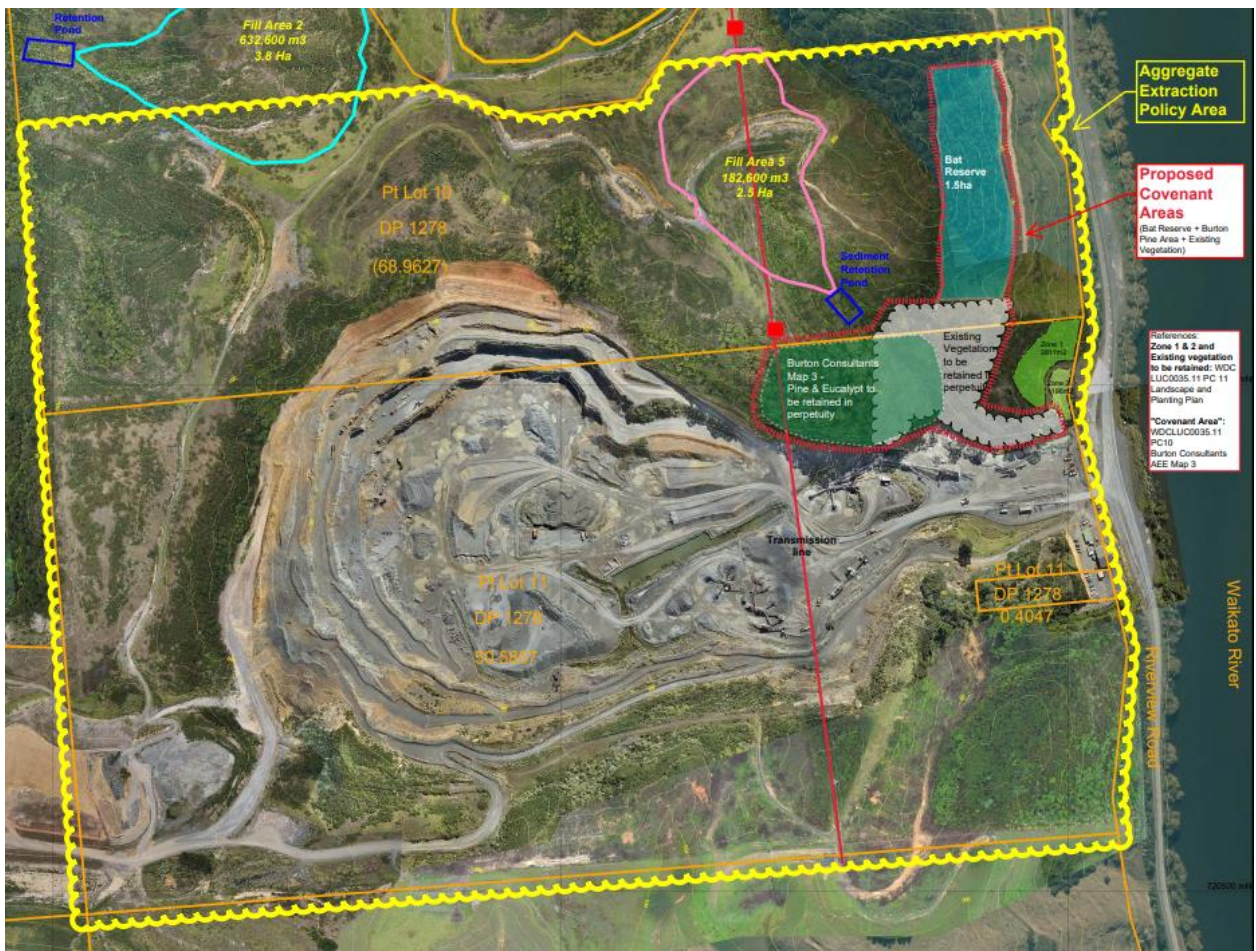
Site Plan sourced from the Resource Consent Application, Fill Area 5 Outlined Pink
